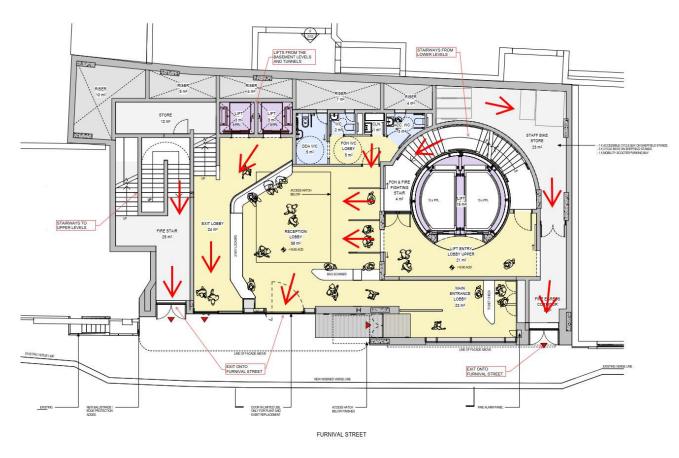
Furnival Street – Ground Level Evacuation Route Plan
